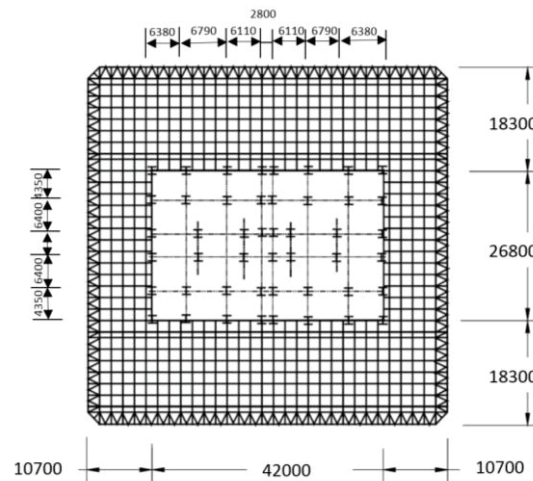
Structure Introduction: plan view of WTC (unit mm)
